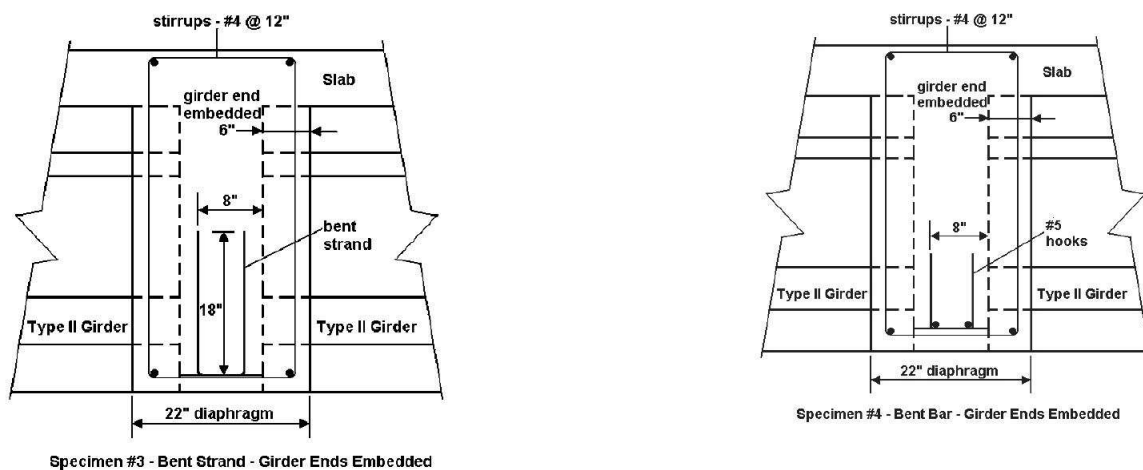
Details of the specimen #3 and #4 connection (Miller 2004).
